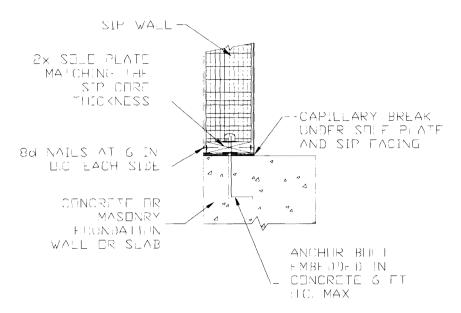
SIP WALL TO CONCRETE SLAB OR FOUNDATION WALL ATTACHMENT
